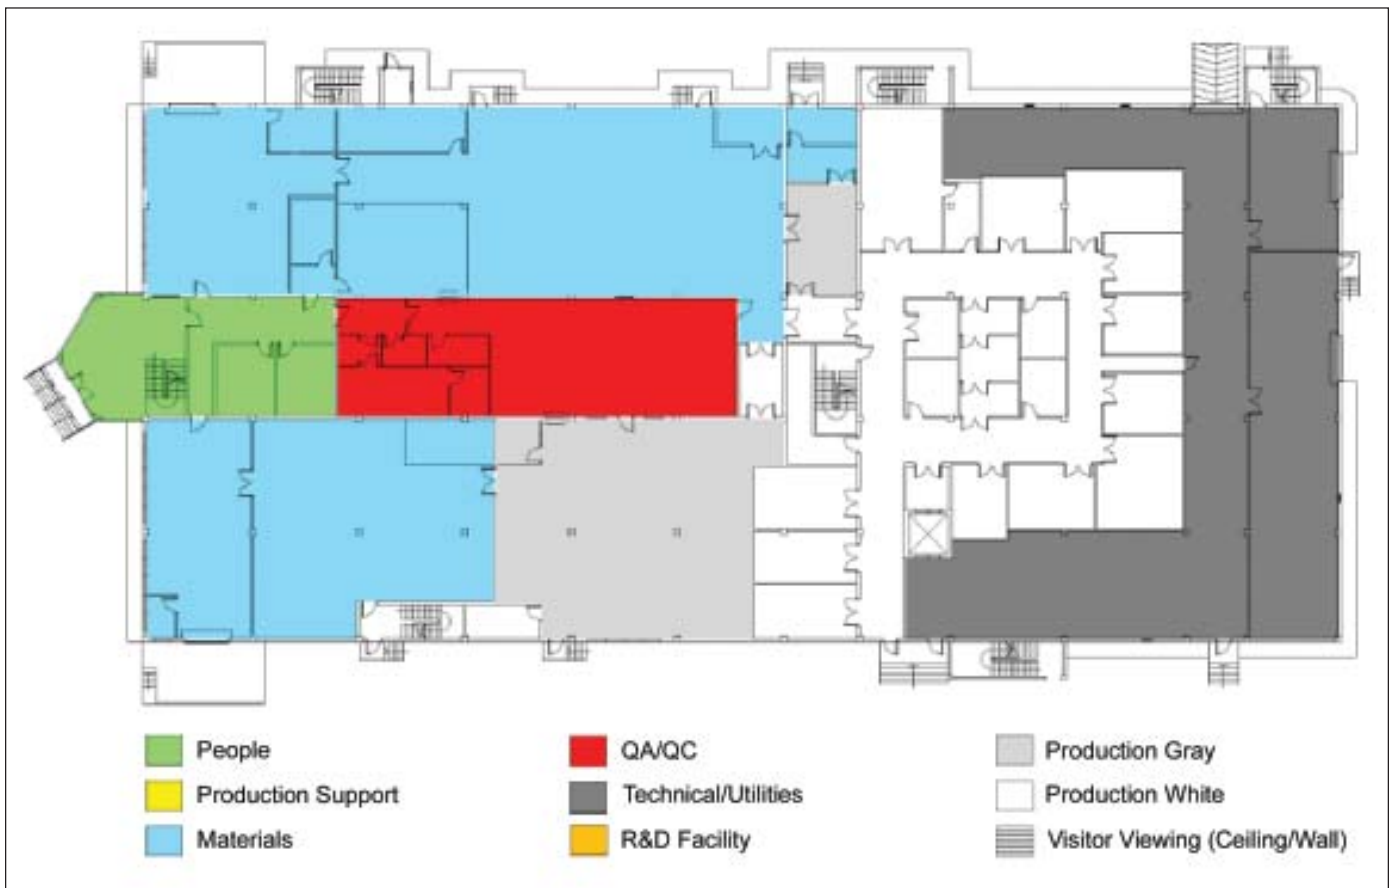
Ground Floor (Level 1) U SPAH facility layout.
